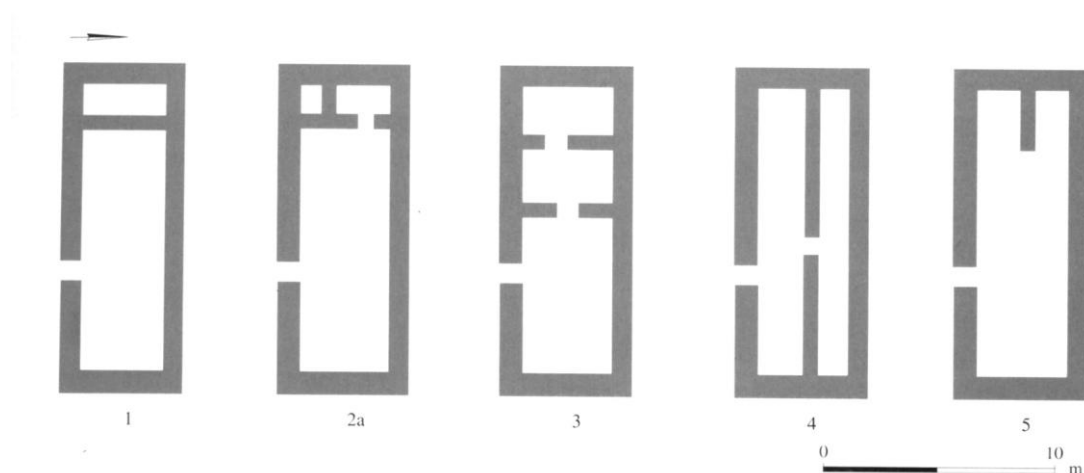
Plan of Chalcolithic Jaulan houses (Epstein, 1998: 9, figure 9)
